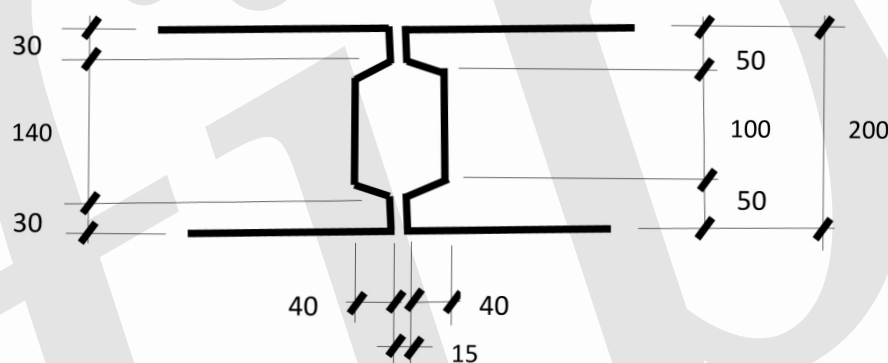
Example of Vertical Solid Wall Joint Profile.
